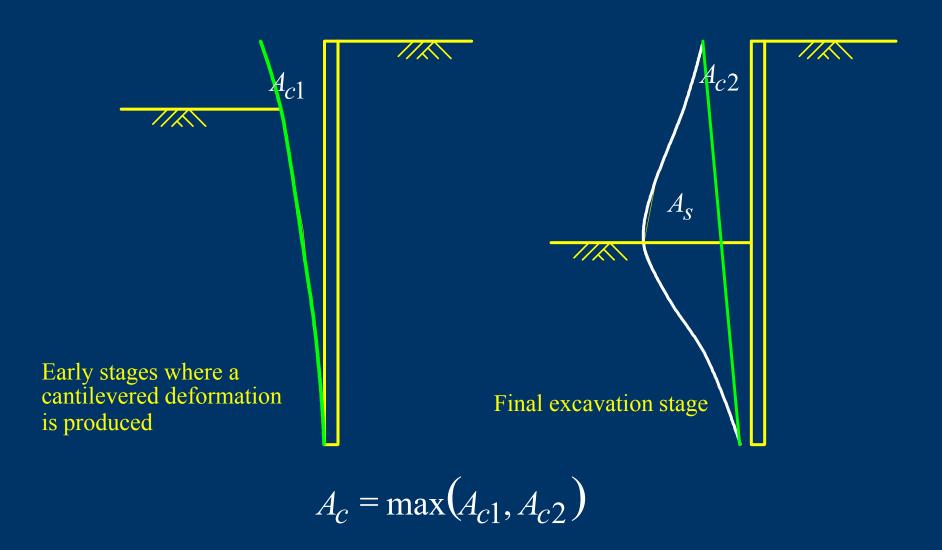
Definitions of the area of the deep inward part and the cantilevered part of wall deformation
